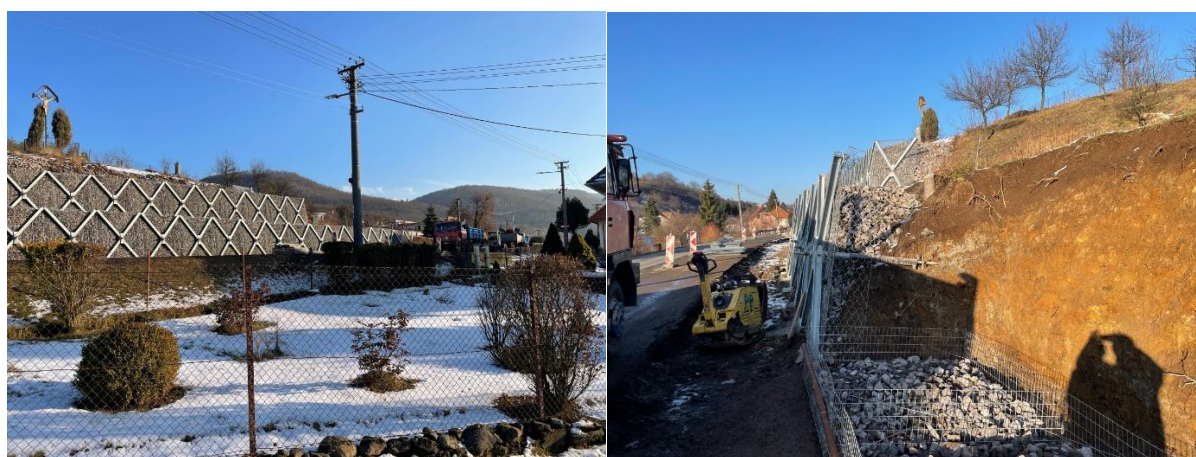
Left: View of the retaining wall - two-stage steel anchored structure; Right: The lower basket of the gabion retaining wall
